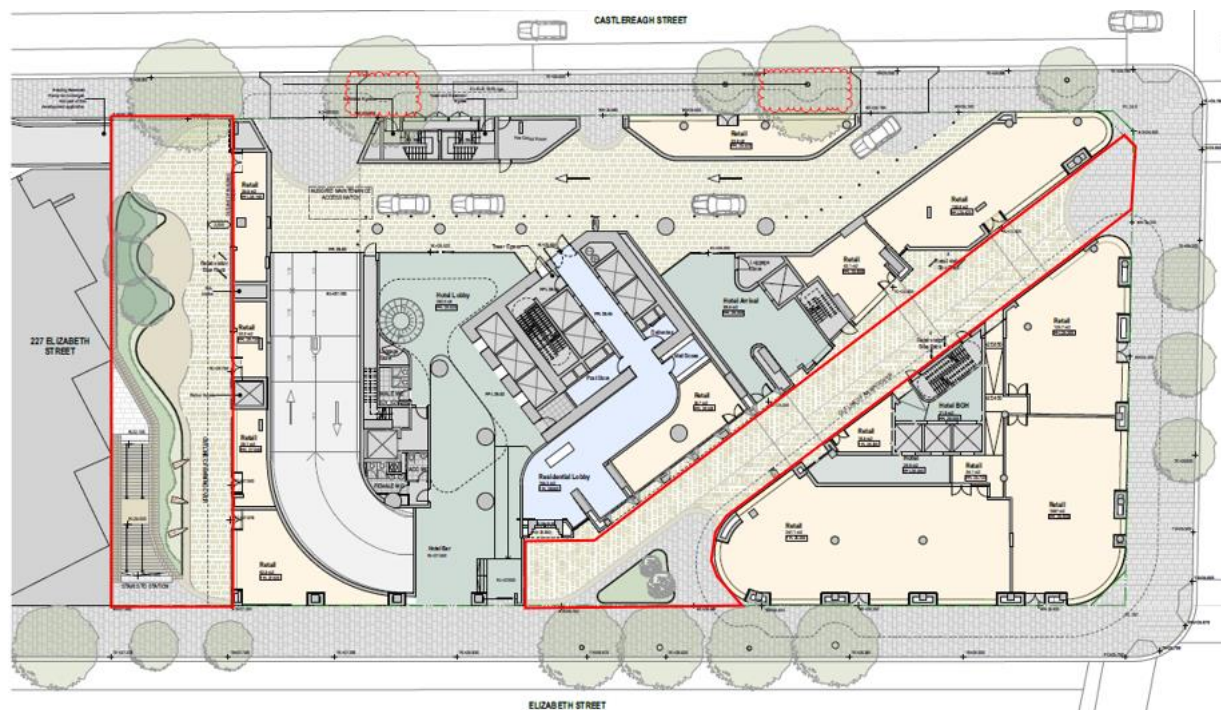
| Proposed ground floor plan, depicting location of through-site links (Source: Ethos Urban RtS amended architectural drawings)
